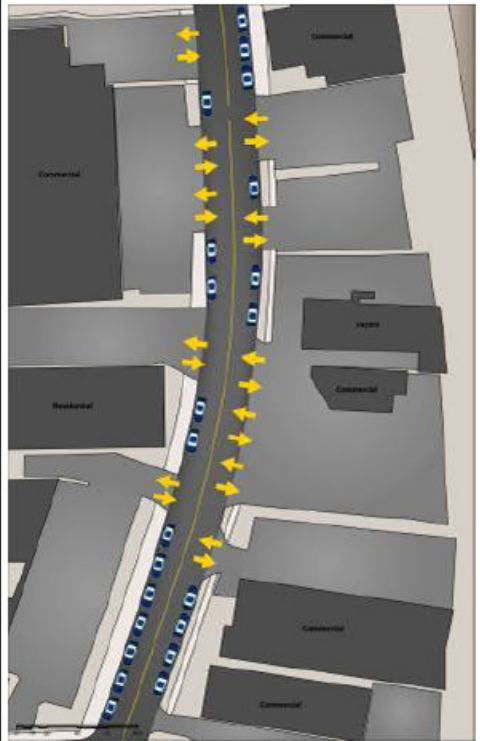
Existing inefficient parking and access conditions on a portion of Glenbrook Road
